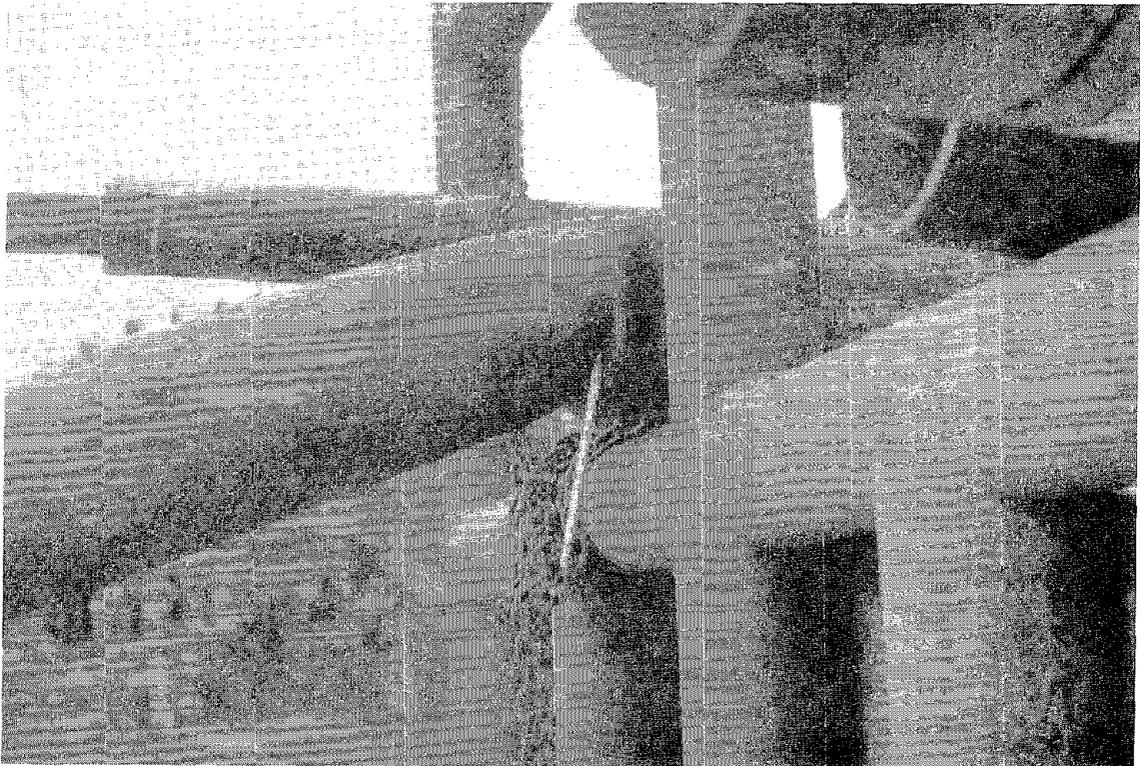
Damaged Portion of RECOPE Pipeline on Back of Repair Truck, Pencil Stuck in Tensile Crack Generated by Severe Local Buckling (Wrinkling) on Compression Side of This Flexural Failure.
